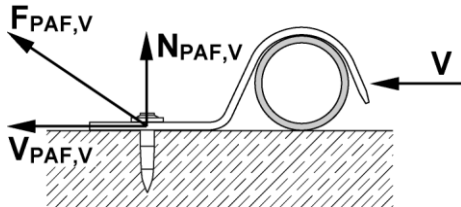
Forces in case of eccentric shear loading of the fixture
